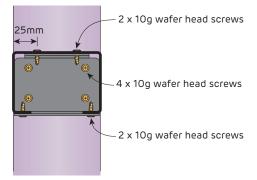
Sill to Jamb Stud Connection With Jamb Stud Connector Bracket Section
